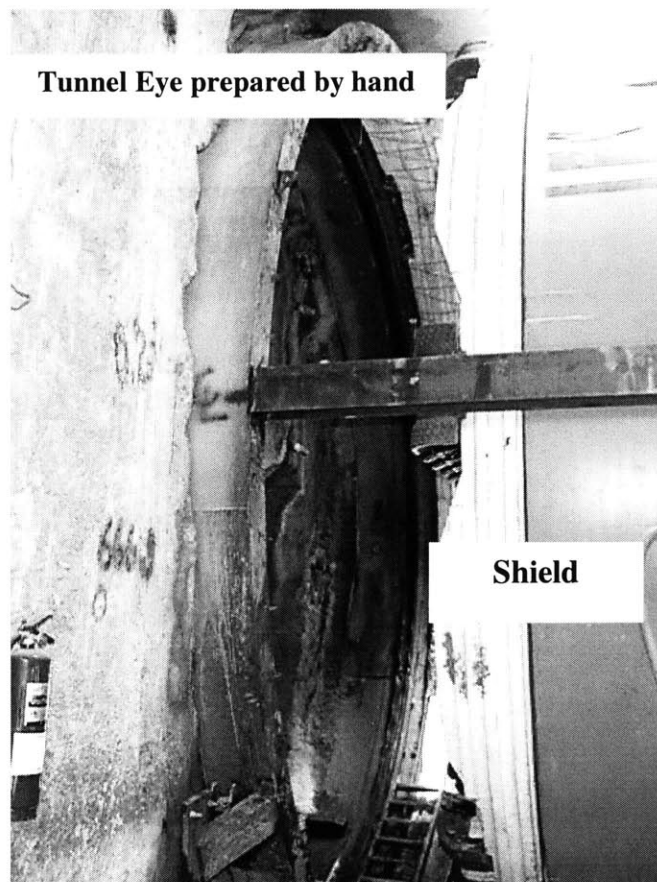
Breakout at Sirikit station (South Tunnel Section)
